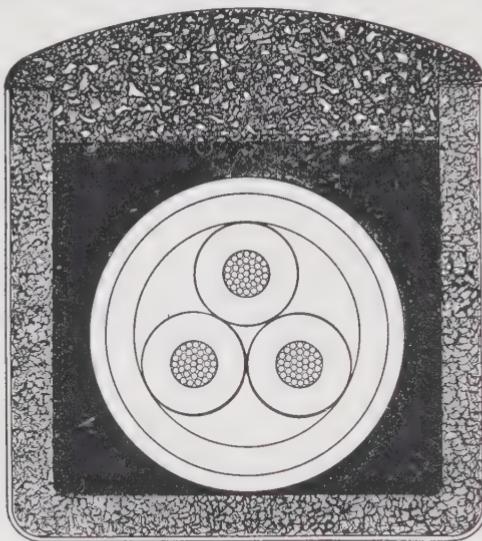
Section through three-core cable laid in Howard asphalt troughing.
